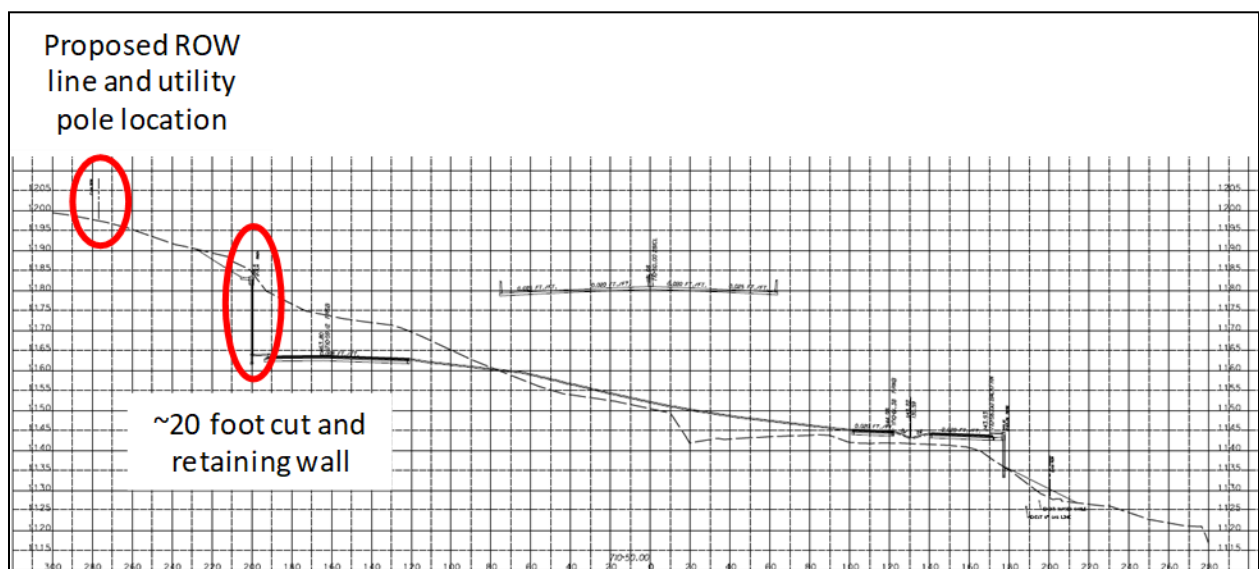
Overhead Utility Relocation and Retaining Wall Construction Issue (38).
